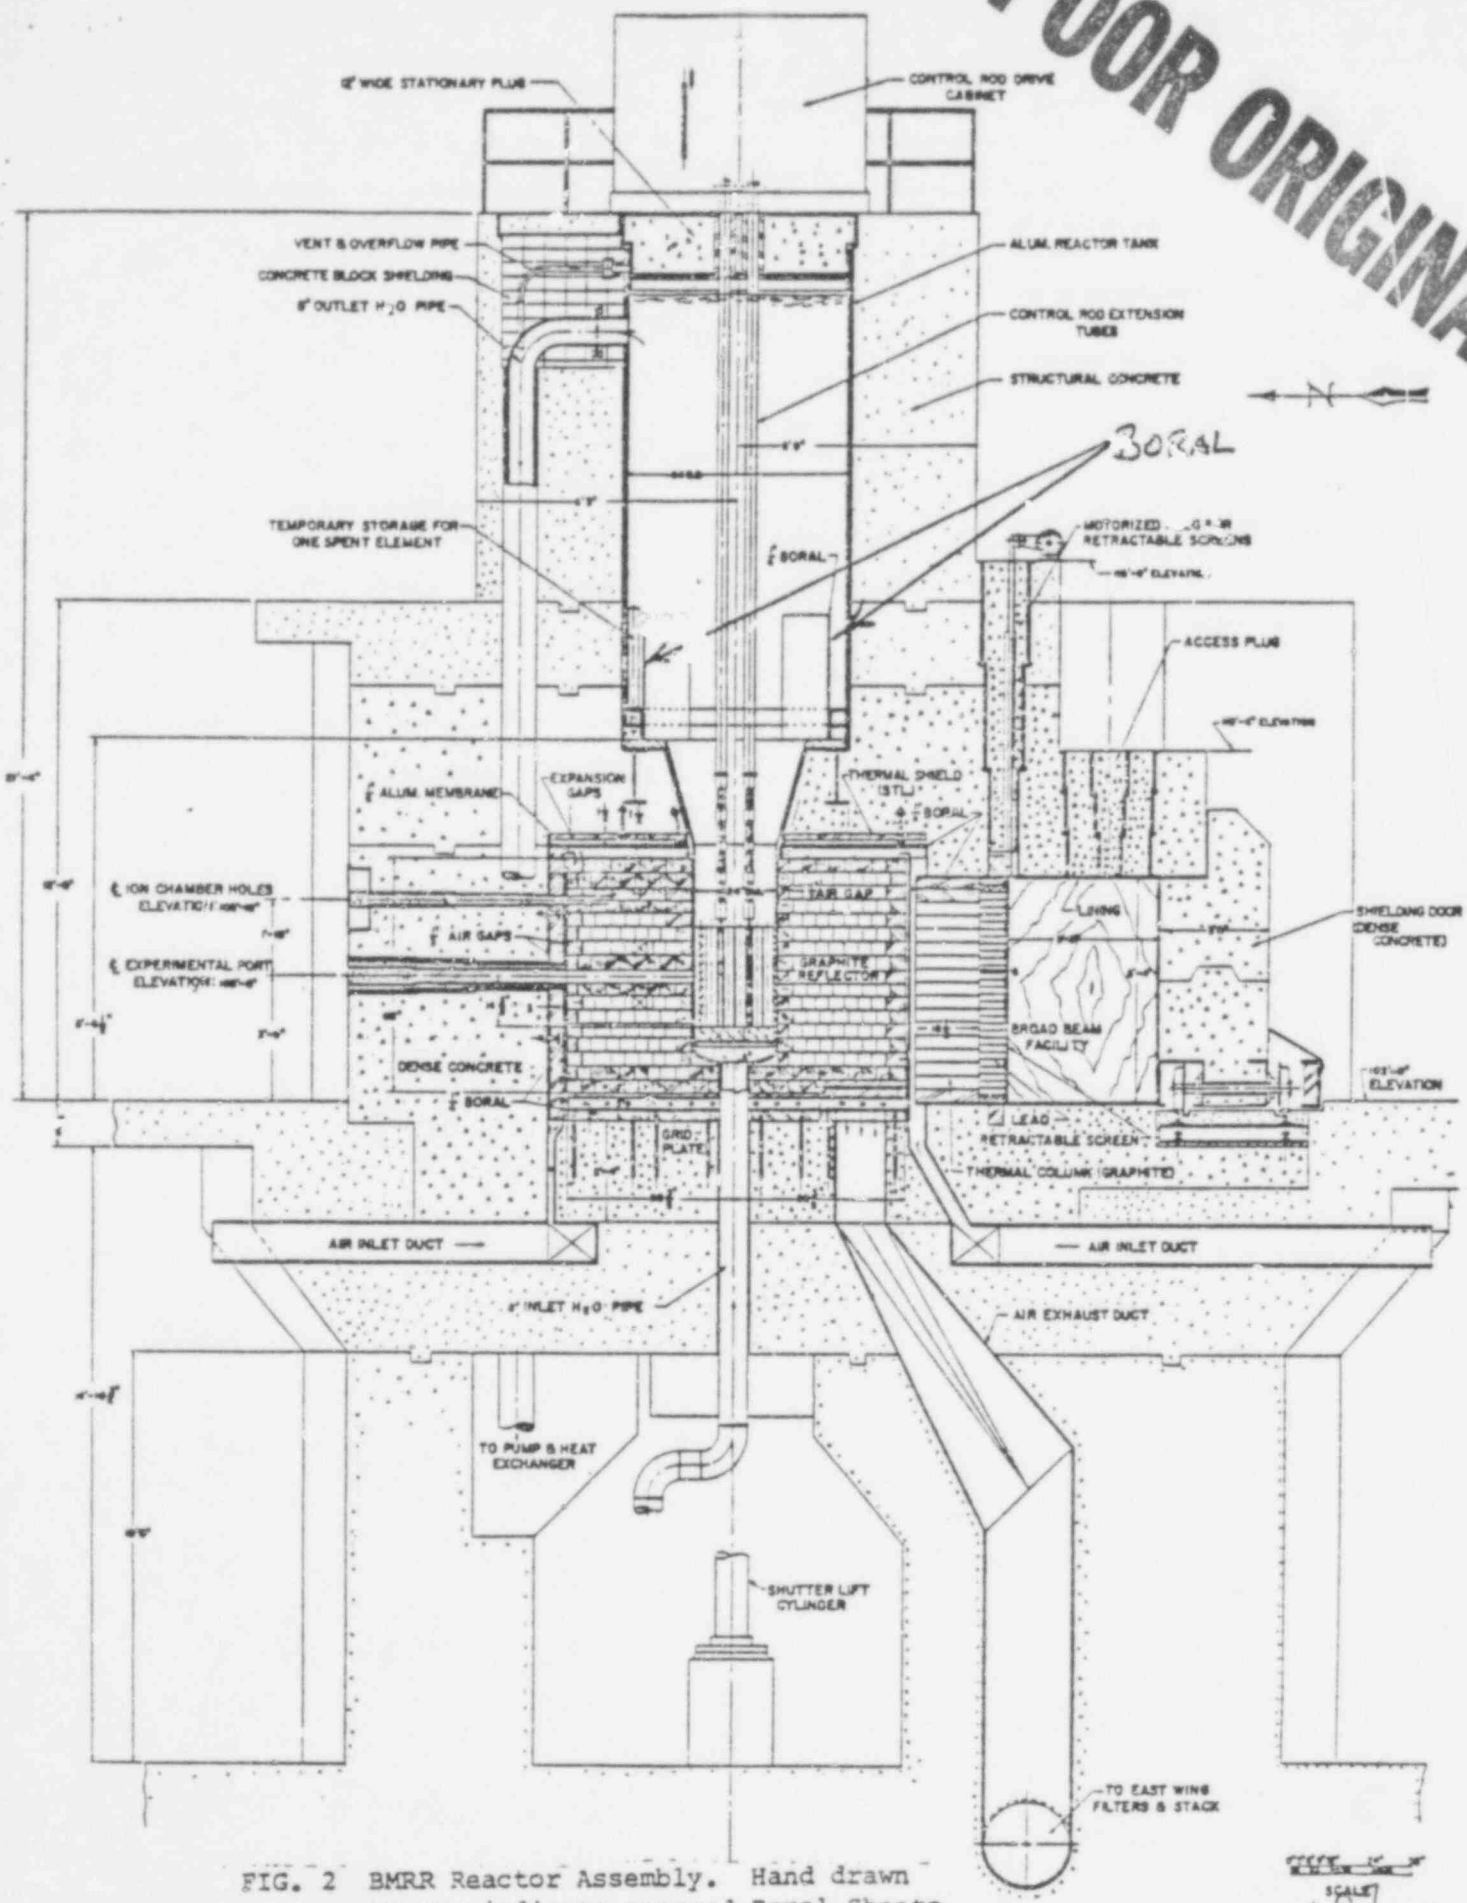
BMRR Reactor Assembly. Hand drawn arrows indicate exposed Boral Sheets. From BNL-600.
